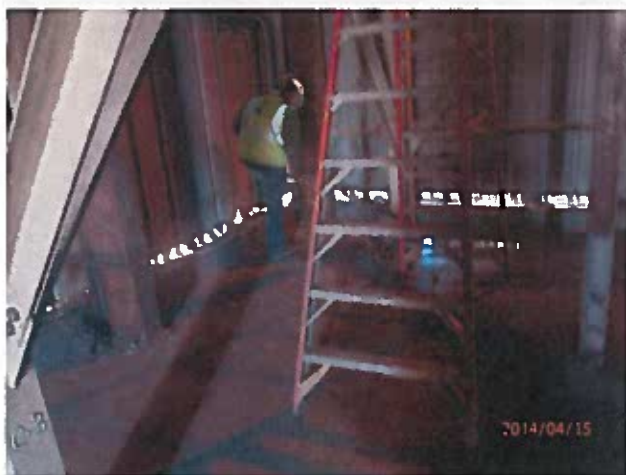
Stabilization Dust Control Silo#1 floor covered in dust and water
